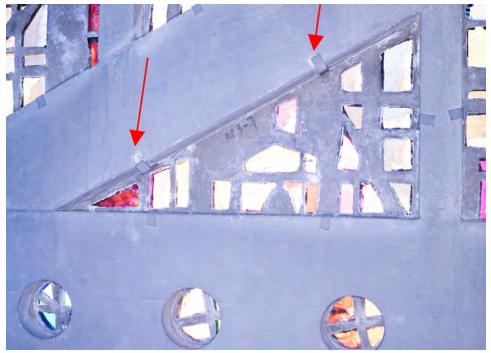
Typical lead straps at original concrete dalle de verre panels. It appears the anchors were used to hold the dalle de verre panels in place against the pre-cast panels while the perimeter grout set. The red arrows indicate areas of clean concrete adjacent to some of the straps, which suggests some of the anchors have been moved; the date and reason for this movement is undetermined.
